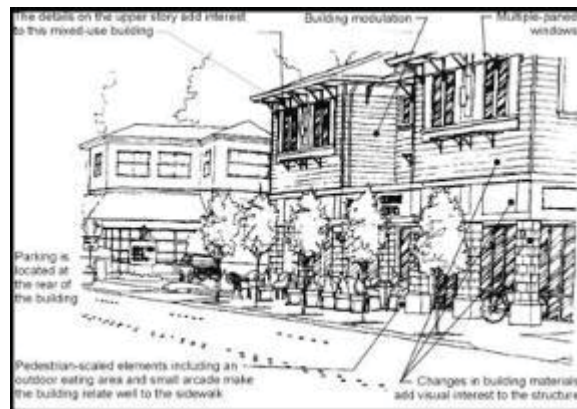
The use of different building materials, window treatments, and roofline brackets add to the visual interest of this building.
